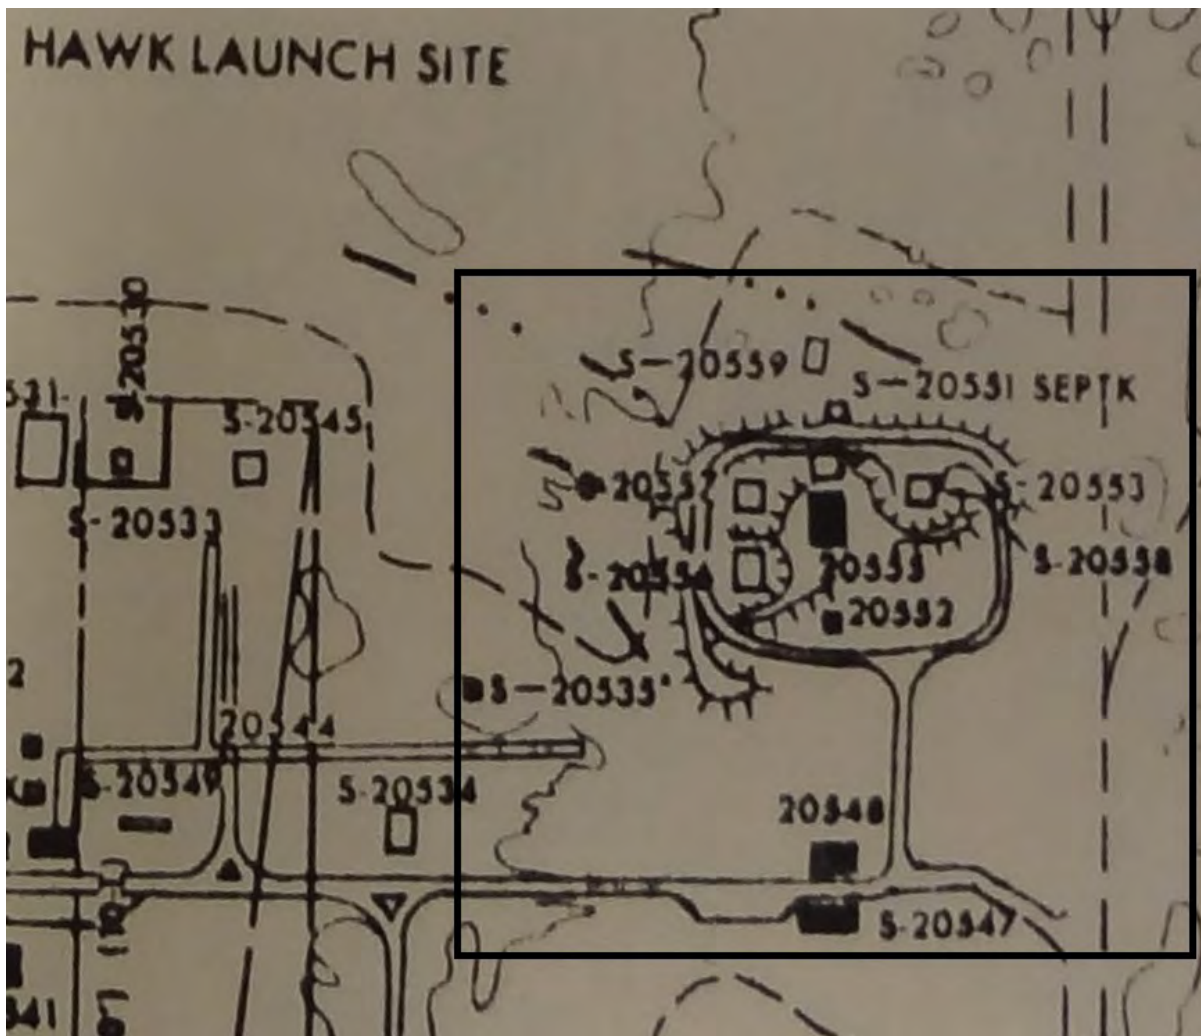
Excerpt from the 1982 WSMR Master Plan of the Hawk Fixed Battery at LC-32.
